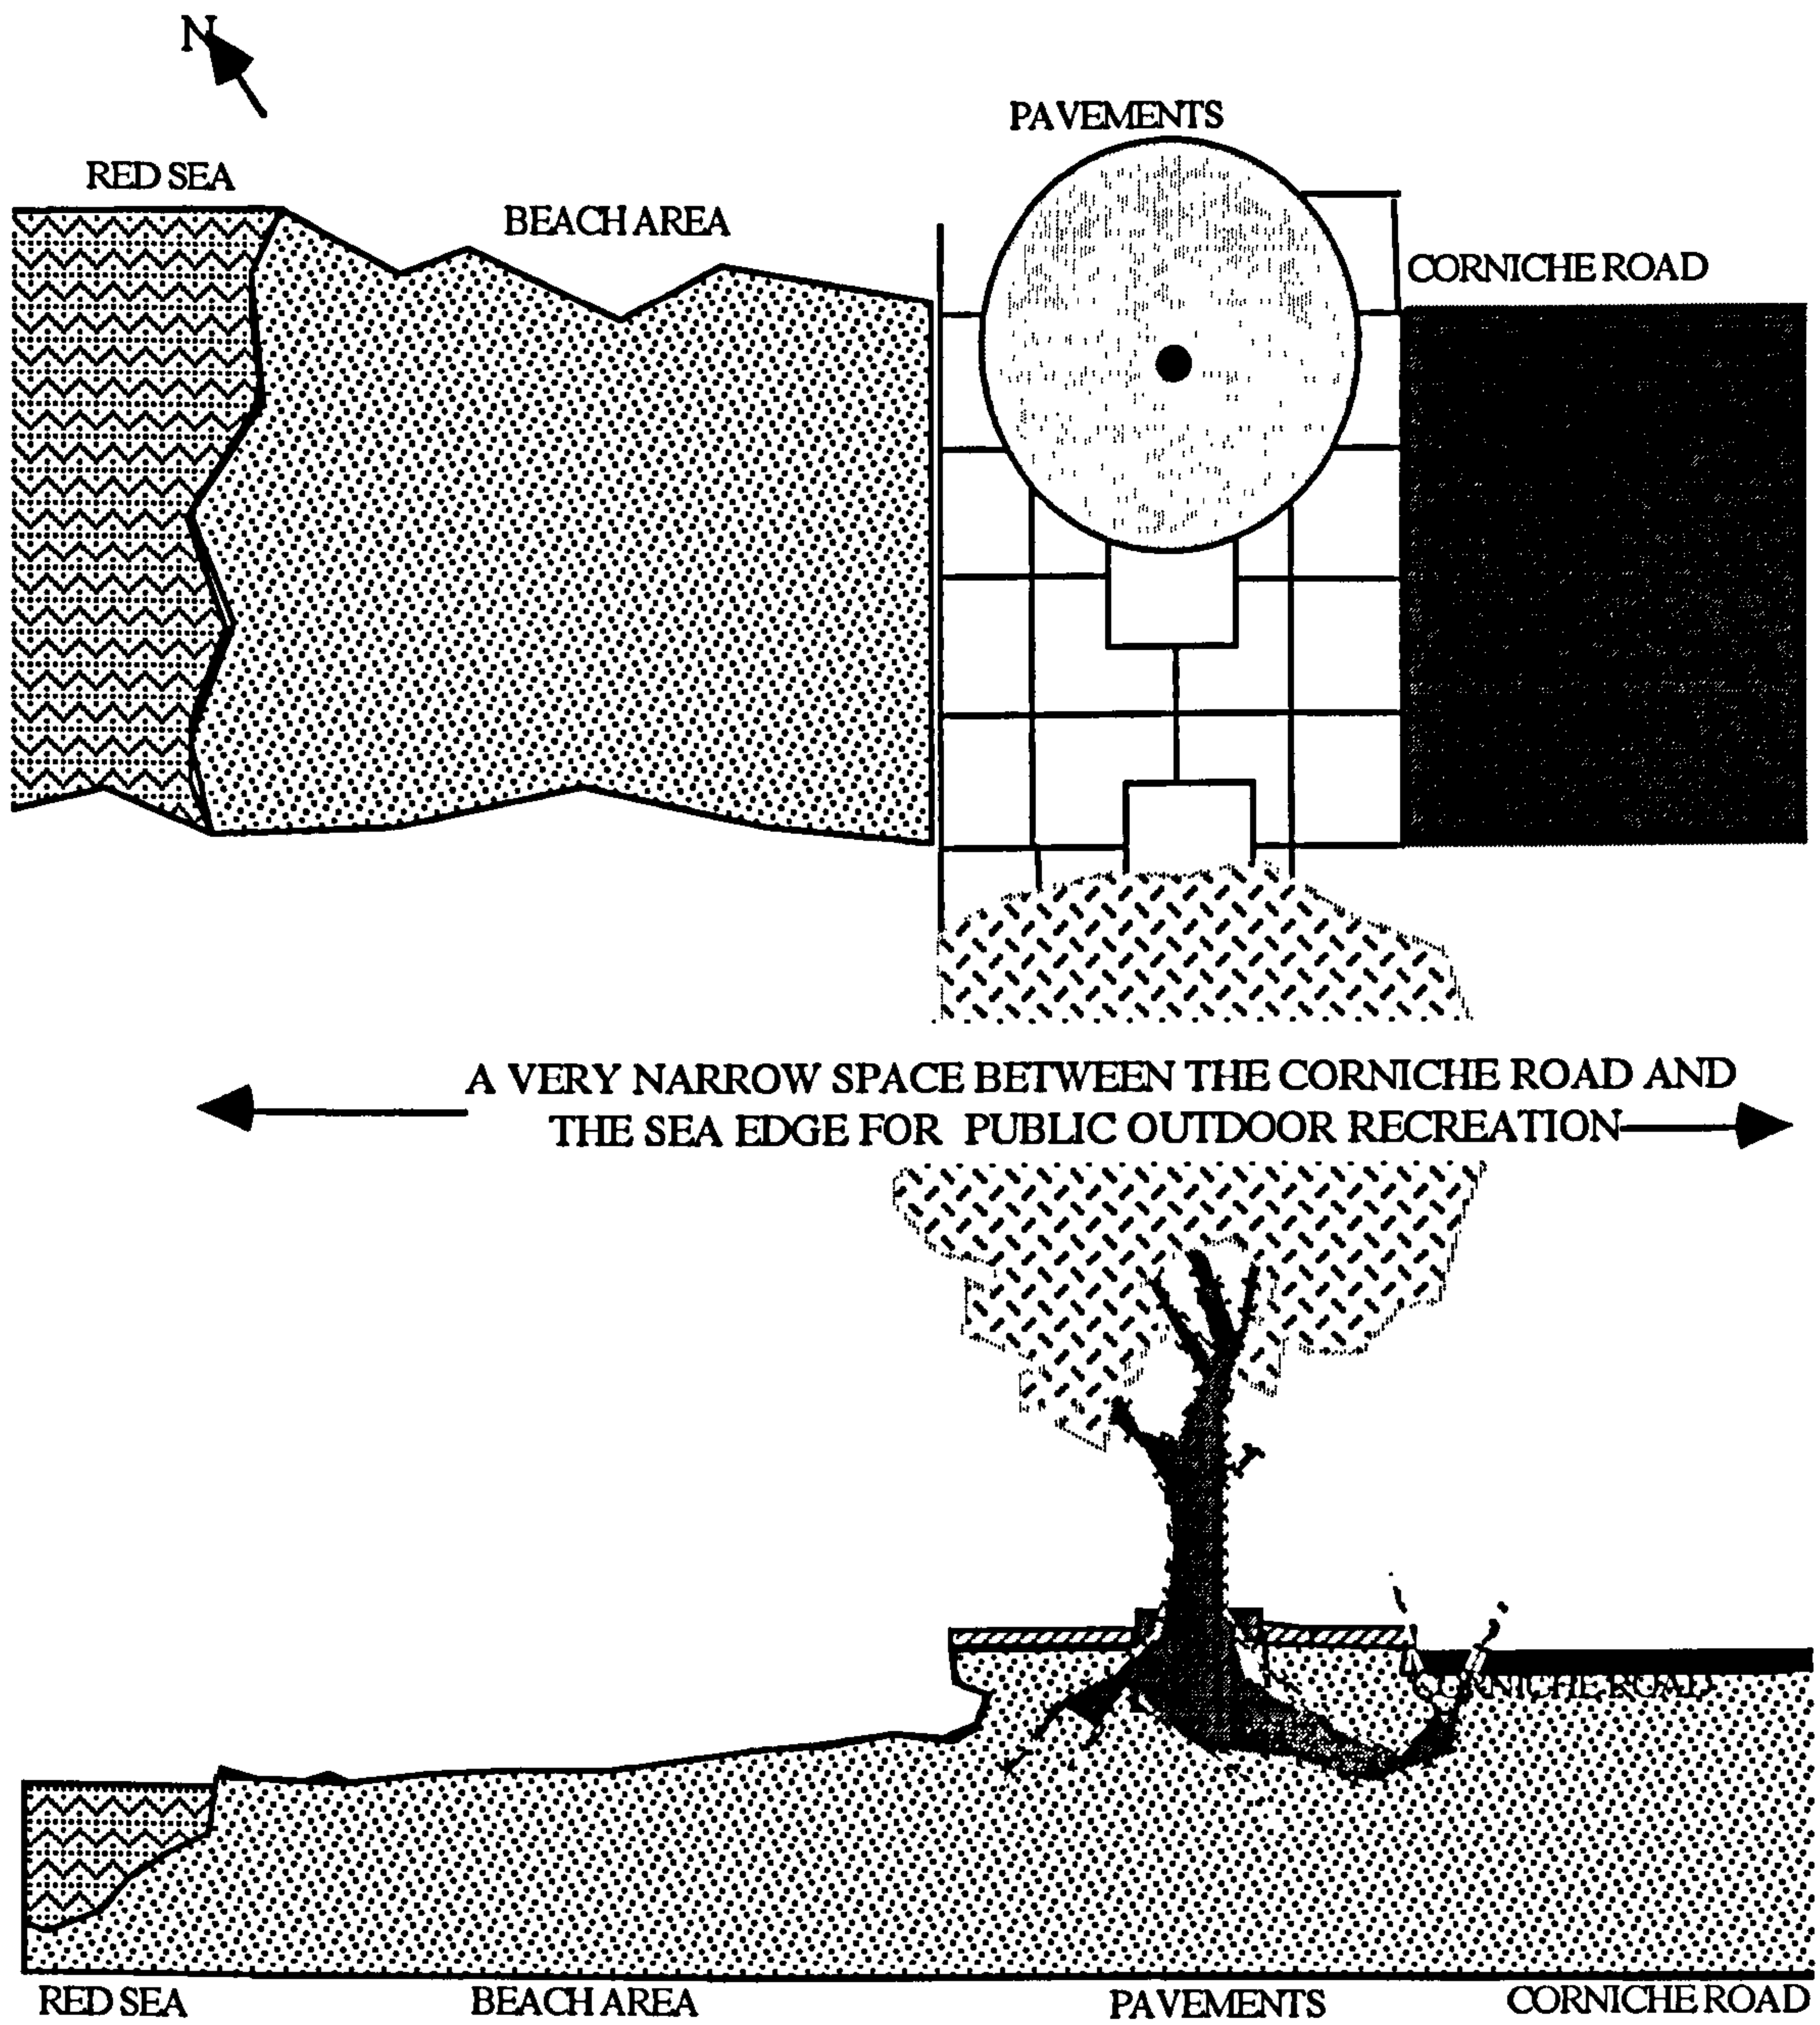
B Plan, section and photographs illustrating the main landscape features of a typical outdoor recreational area of the North Corniche.
